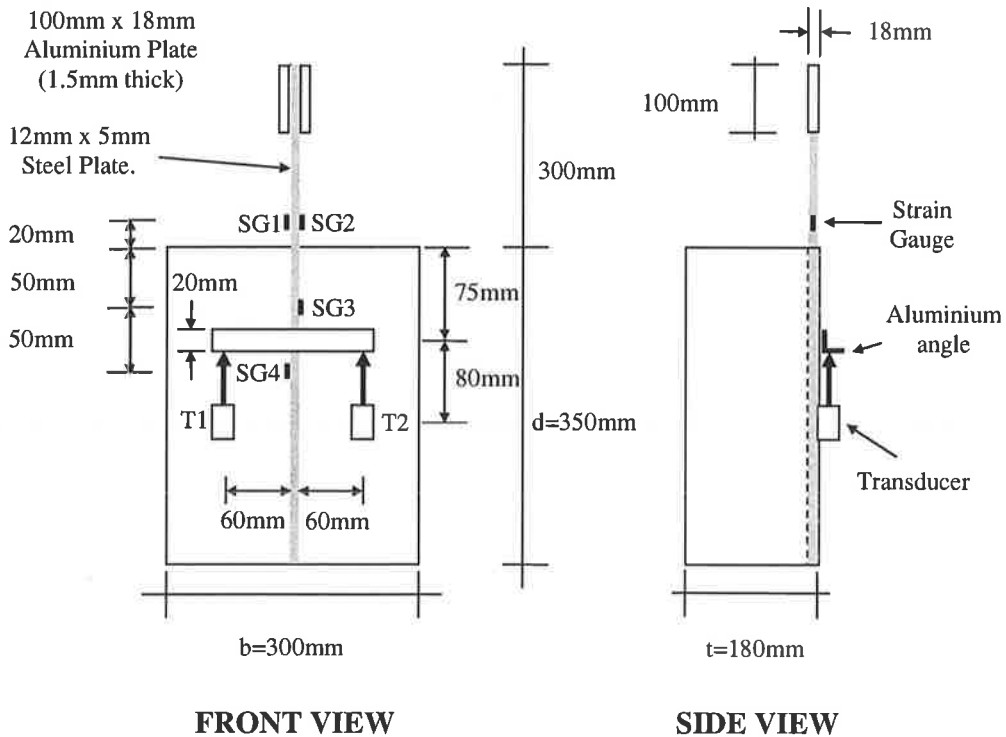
Pull test of 12mm x 5mm Steel plate details.
